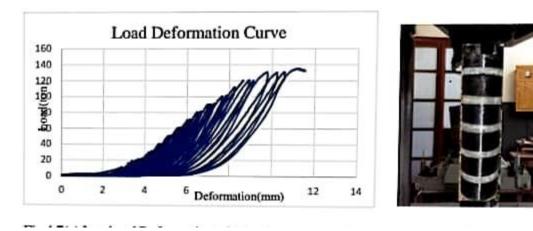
(a) Load and Deformation of CRC(FRP+PVC) Column
